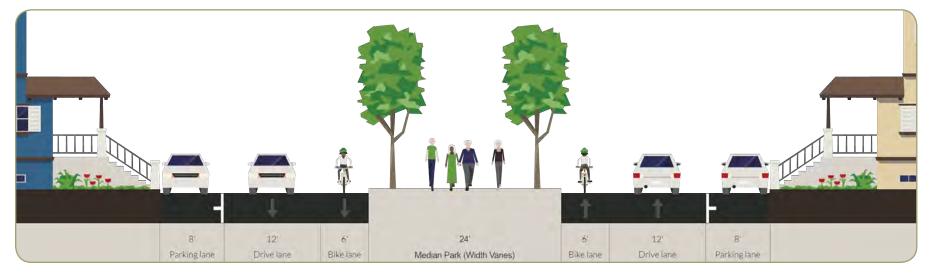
Proposed cross section of Electric Avenue left side bike lanes
